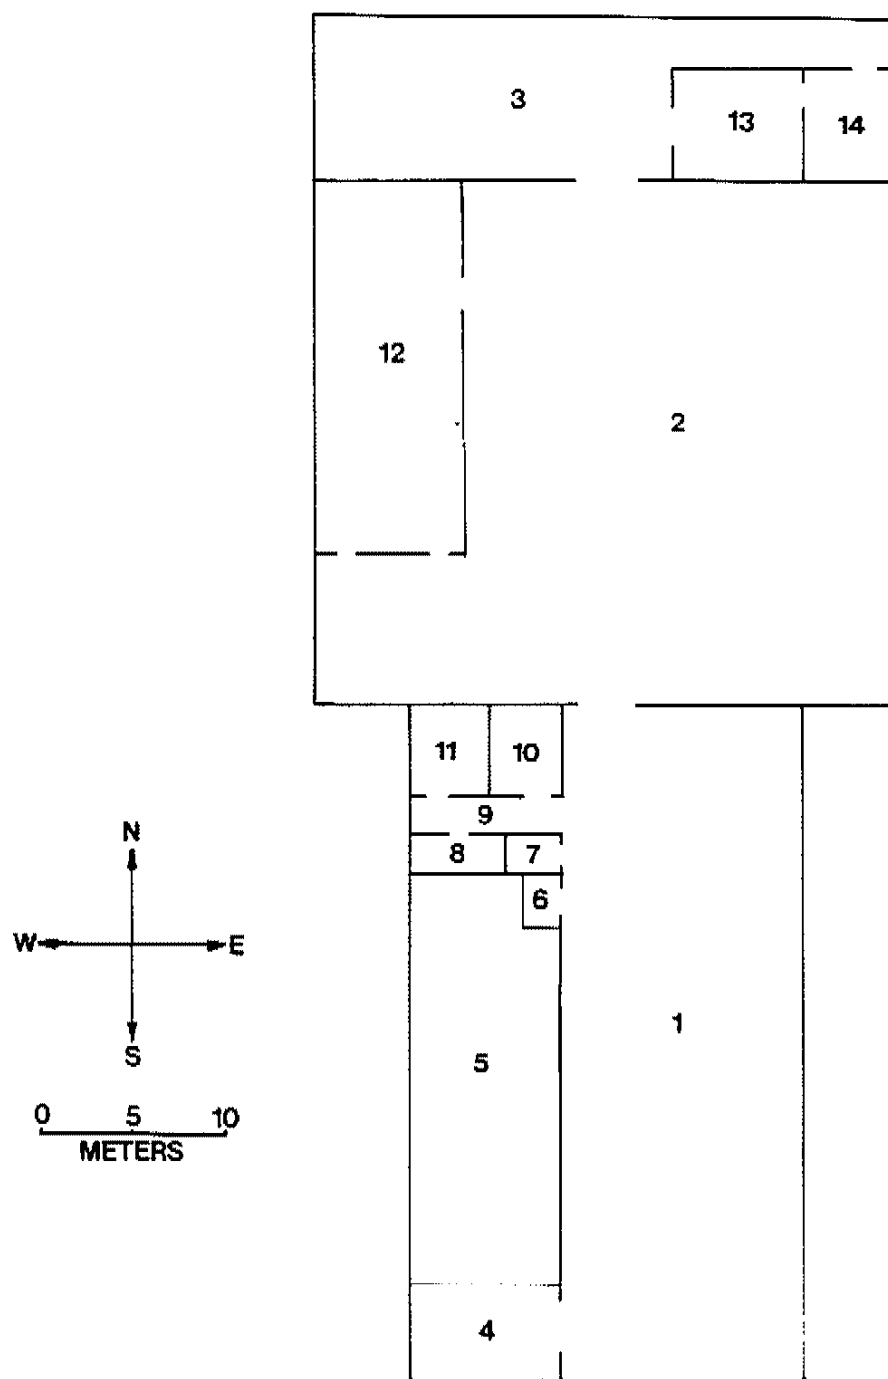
Plan of Warehouse Indicating Room Designations for Survey Reference.
